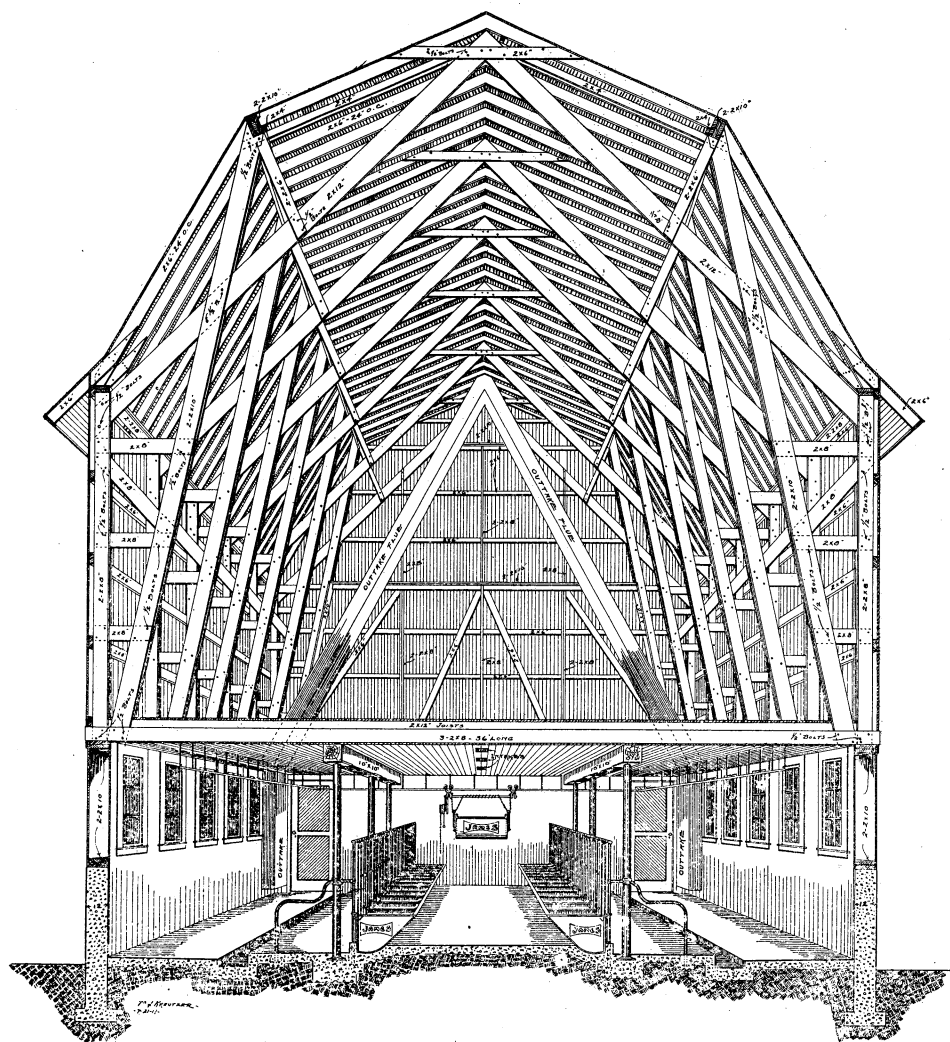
SHOWING STYLE OF PLANK FRAMING.
